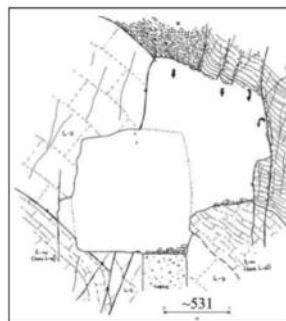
Roof and wall instability in thin-bedded folded and faulted horizons (ch.531).
